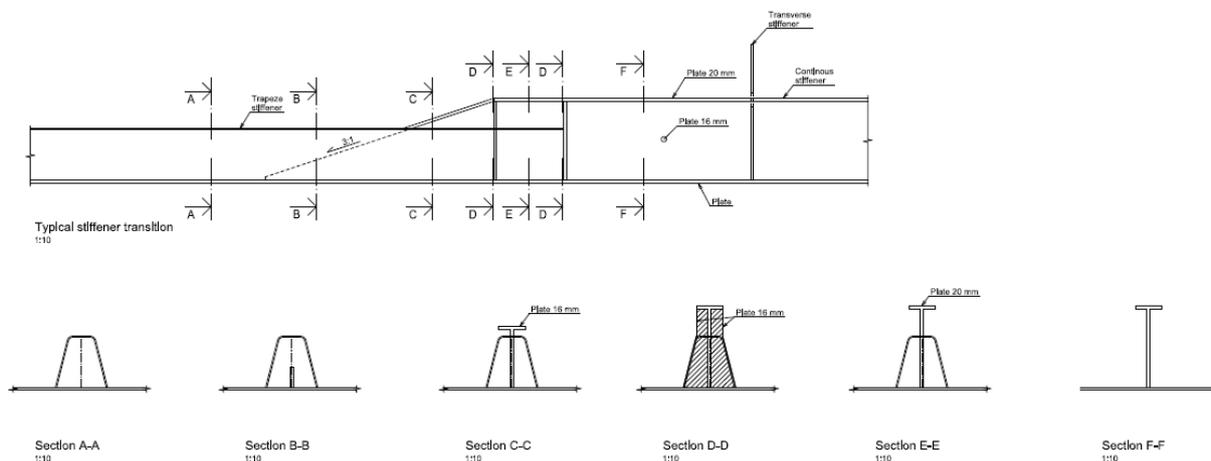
Stiffener transition from trapeze stiffener to T-stiffener
